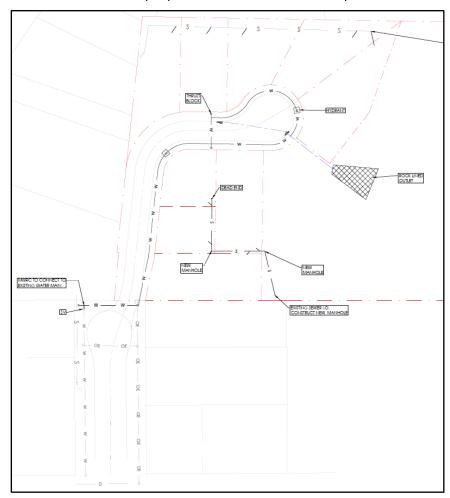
Excerpt Servicing Plan prepared by Triaxial Consulting Pty Ltd (refer to complete plan set for notes and legend)
